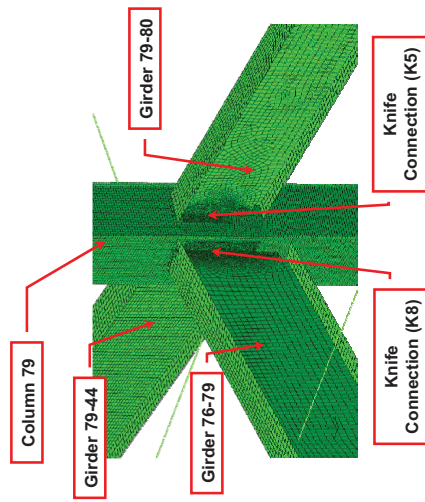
ABAQUS rendering of arrangement of detailed girders and connections at column 79 showing the K8 and K5 knife connections.
